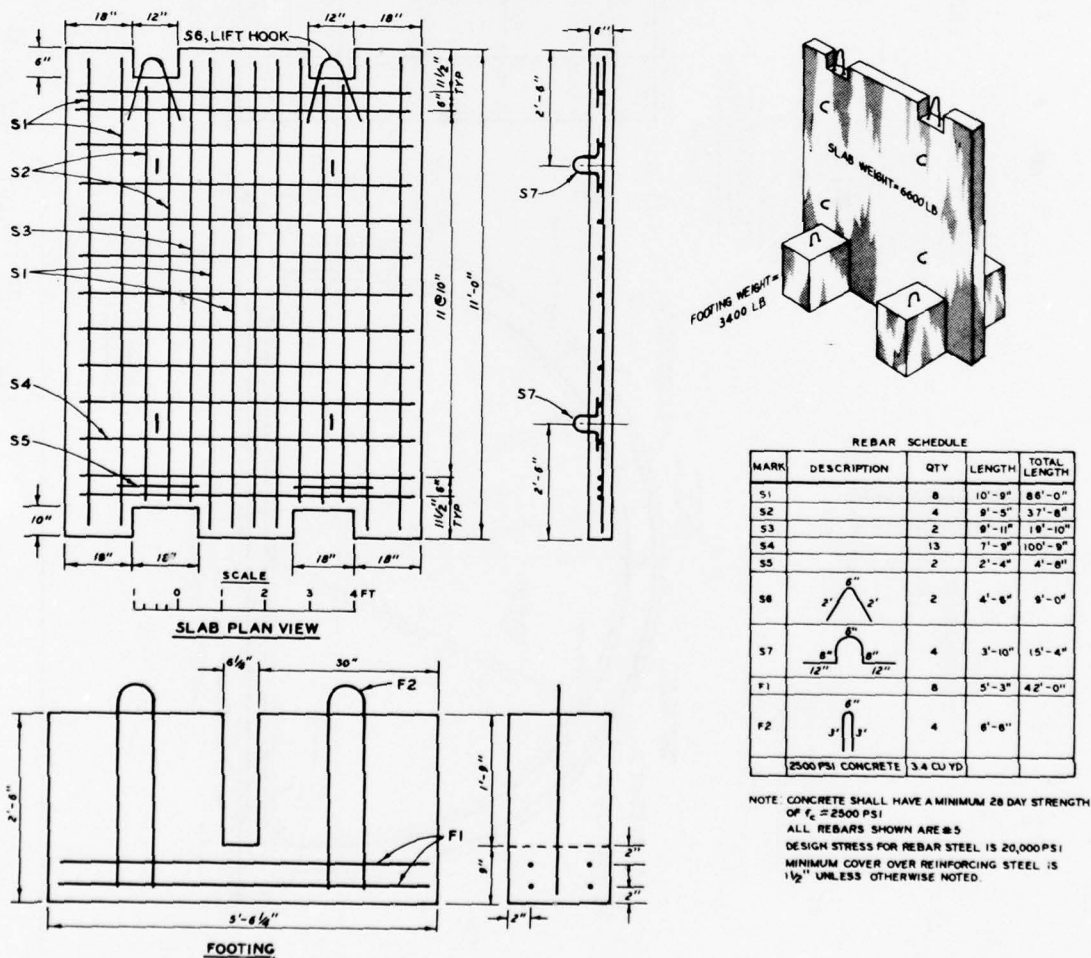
Structural plans for precast concrete panel revetment with footers (from Reference 54)
